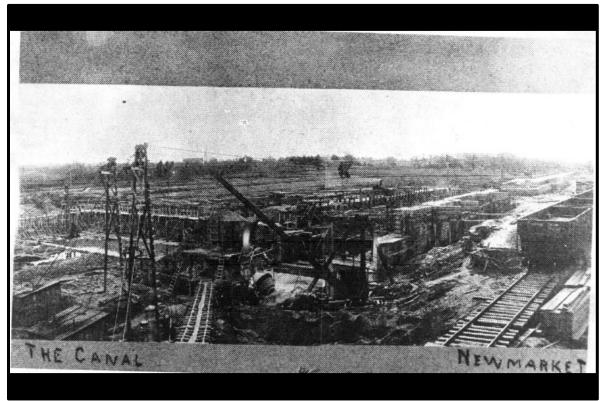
Newmarket Canal construction (Adapted from Dodge 2009)
